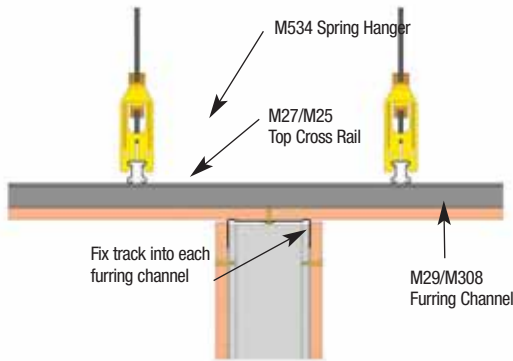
Exposed T-Bar Ceiling Connection Detail
